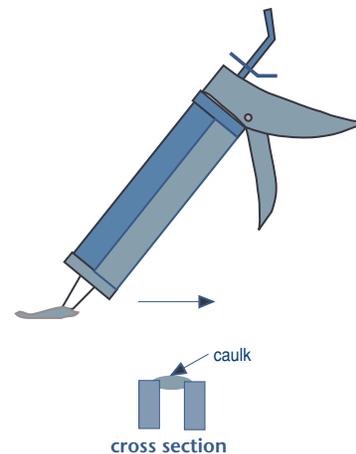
Hold caulking gun at 45° angle, and make sure the bead of caulk is wide enough to overlap and adhere to both sides of the opening.
